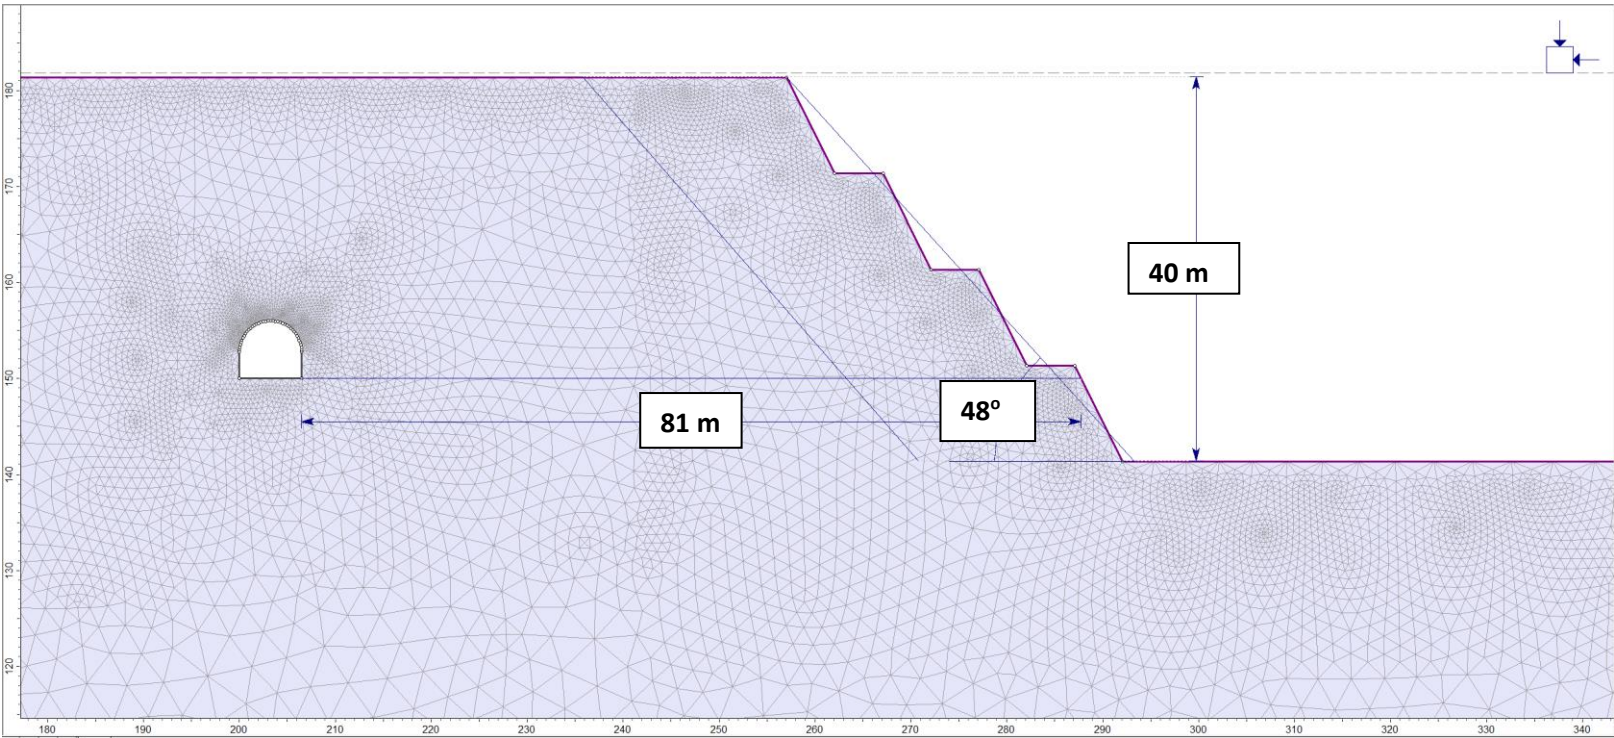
Slope dimensions and finite element model of the planned slope profile, section A-A', Km 26+680
